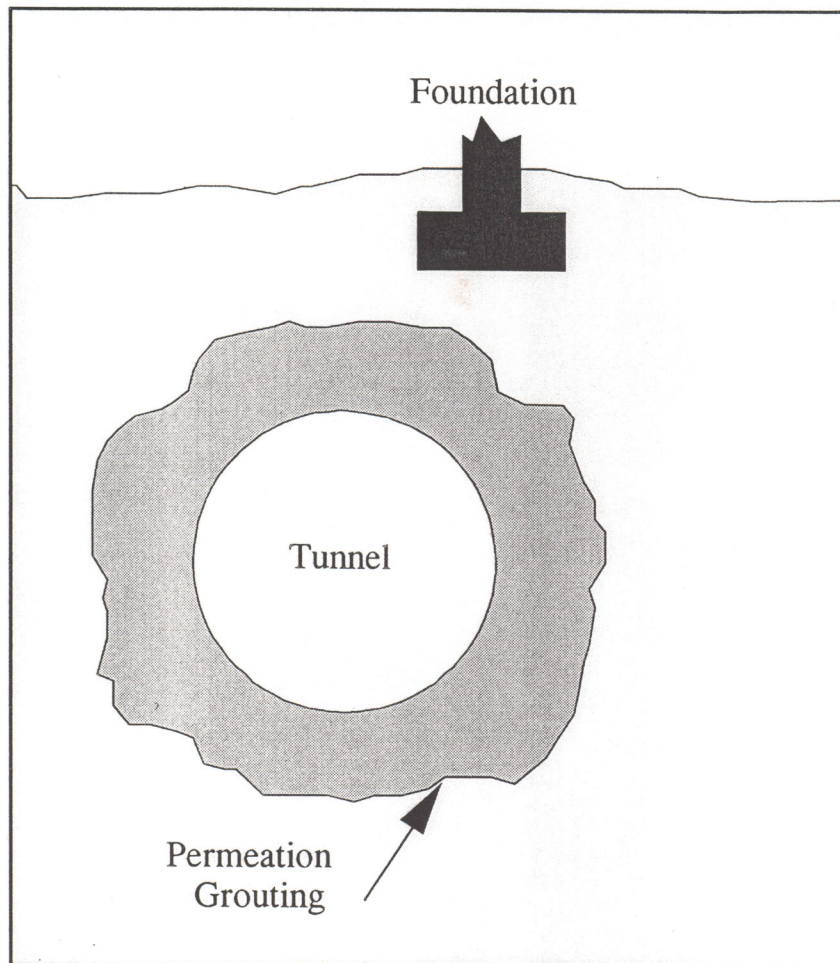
Tunnel Excavation Support Using Permeation Grouting.
